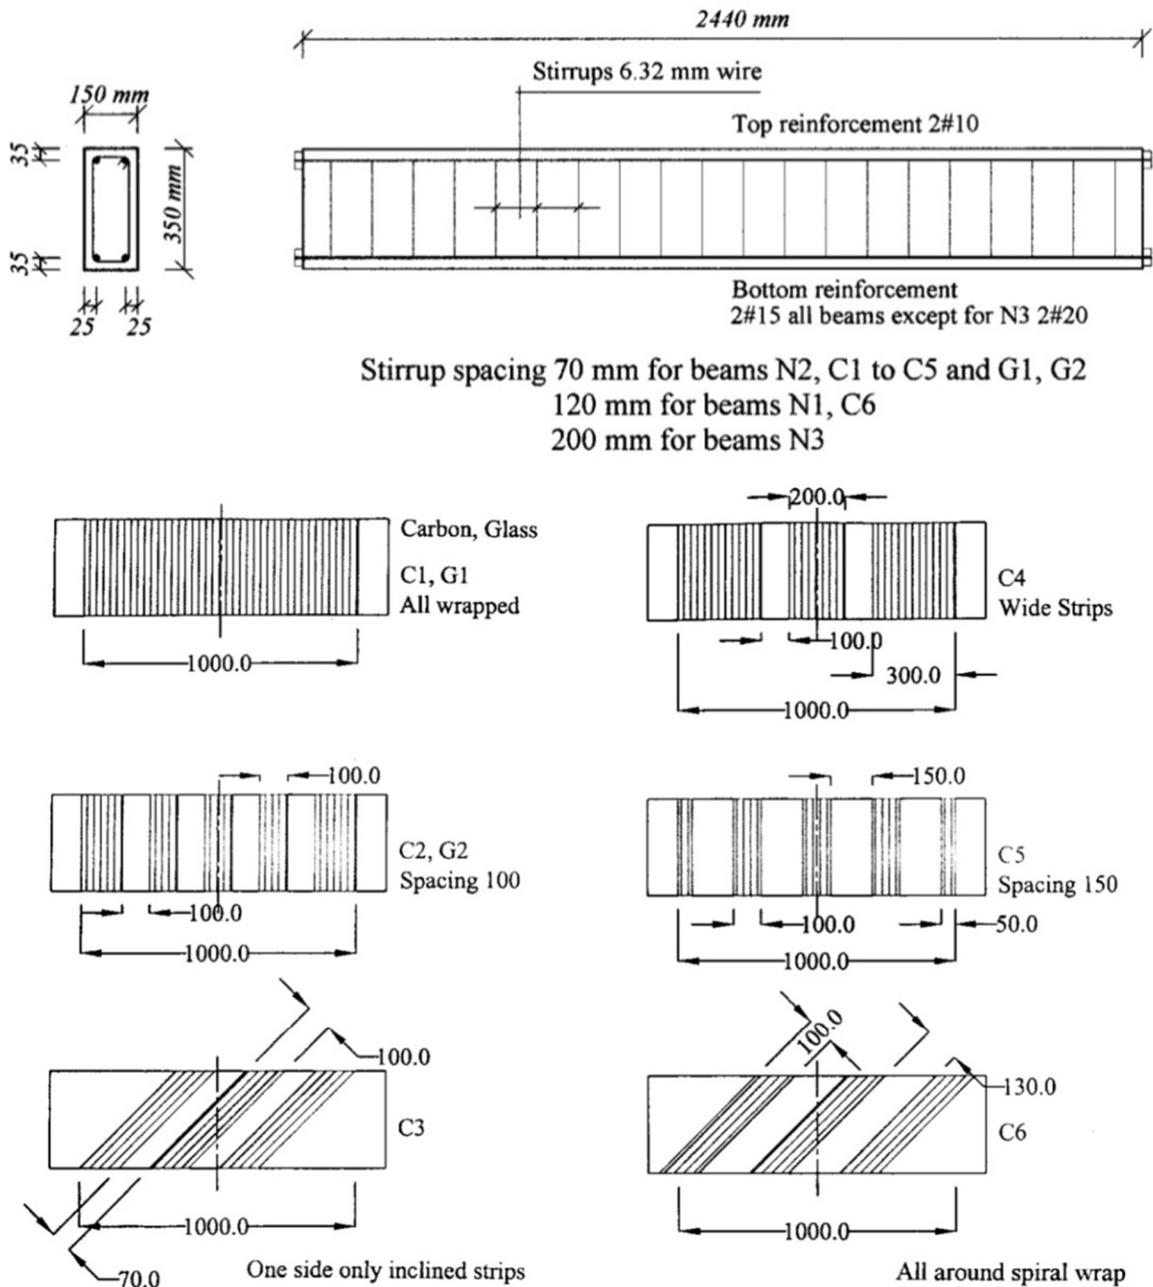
Dimensions, reinforcement details and strengthen of the tested beams by Ghobara, et. al. (2002).
